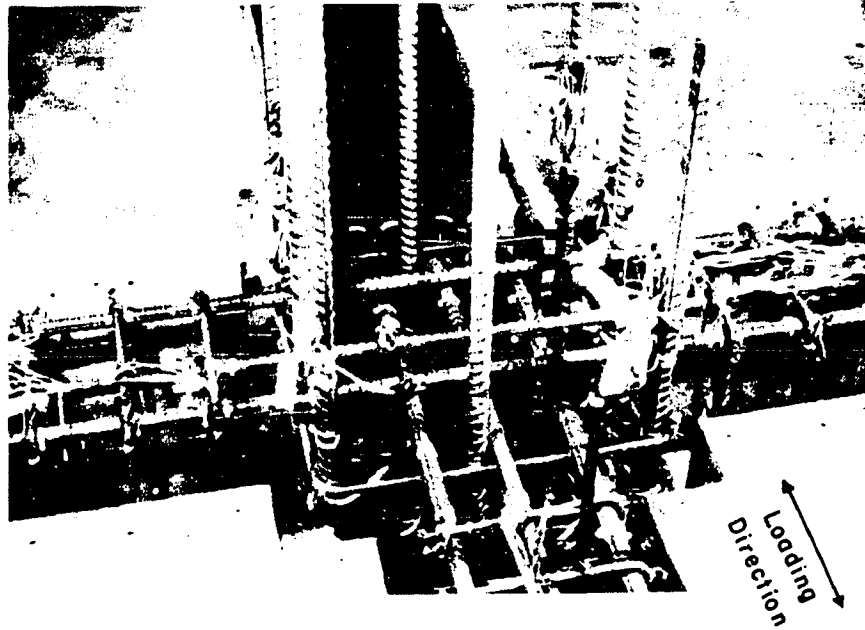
Exterior joint reinforcing detail, prototype test specimen
